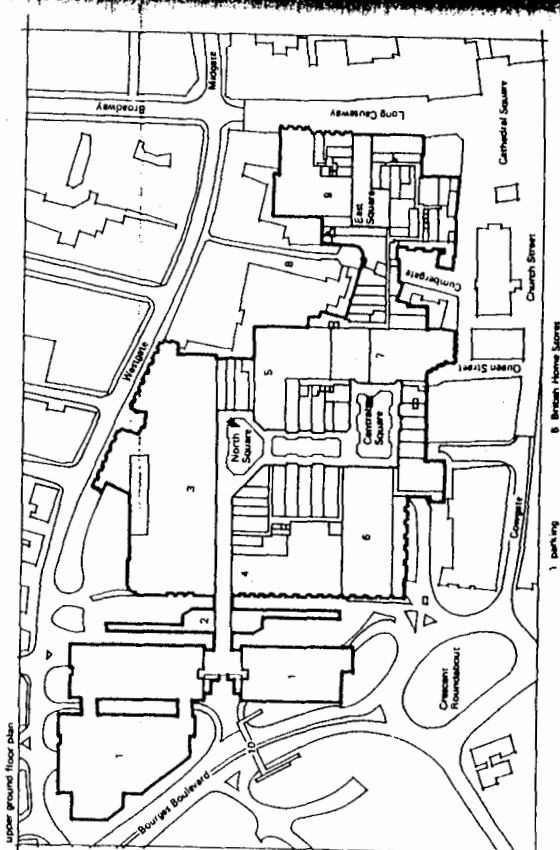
Overlap City, Peterborough (Designed by Peterborough Development Corporation) (shaded) Lower ground floor plan (lines) Upper ground floor plan
